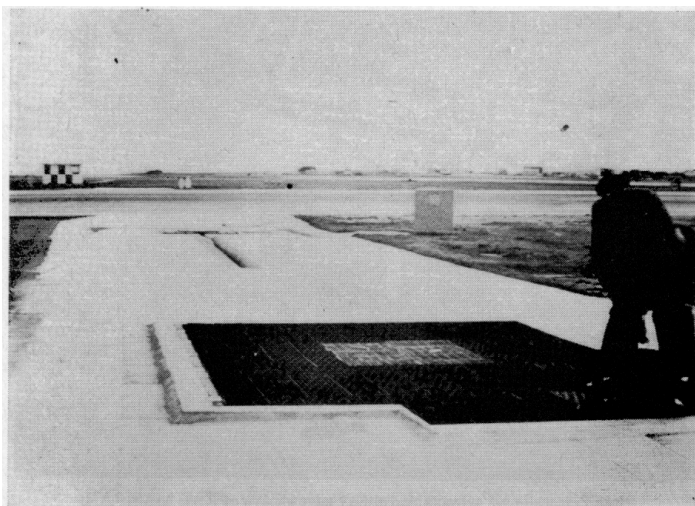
An installation at RAF LUQA with flush buried EAU's and retracted runway edge sheaves.
